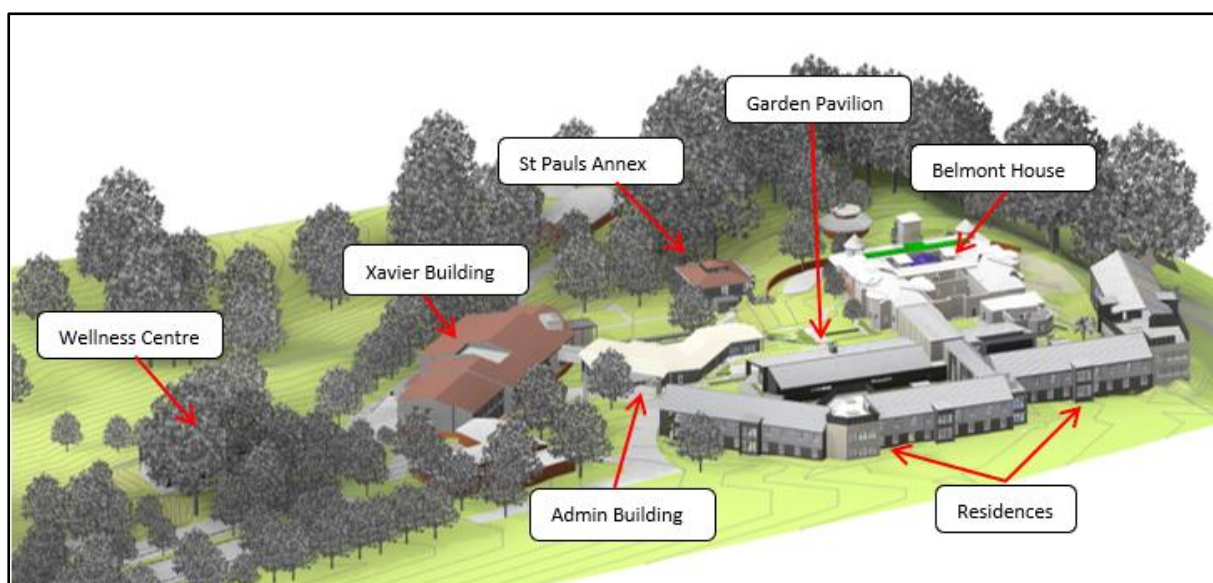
| Site perspective looking east (Source: Applicant's RtS)
